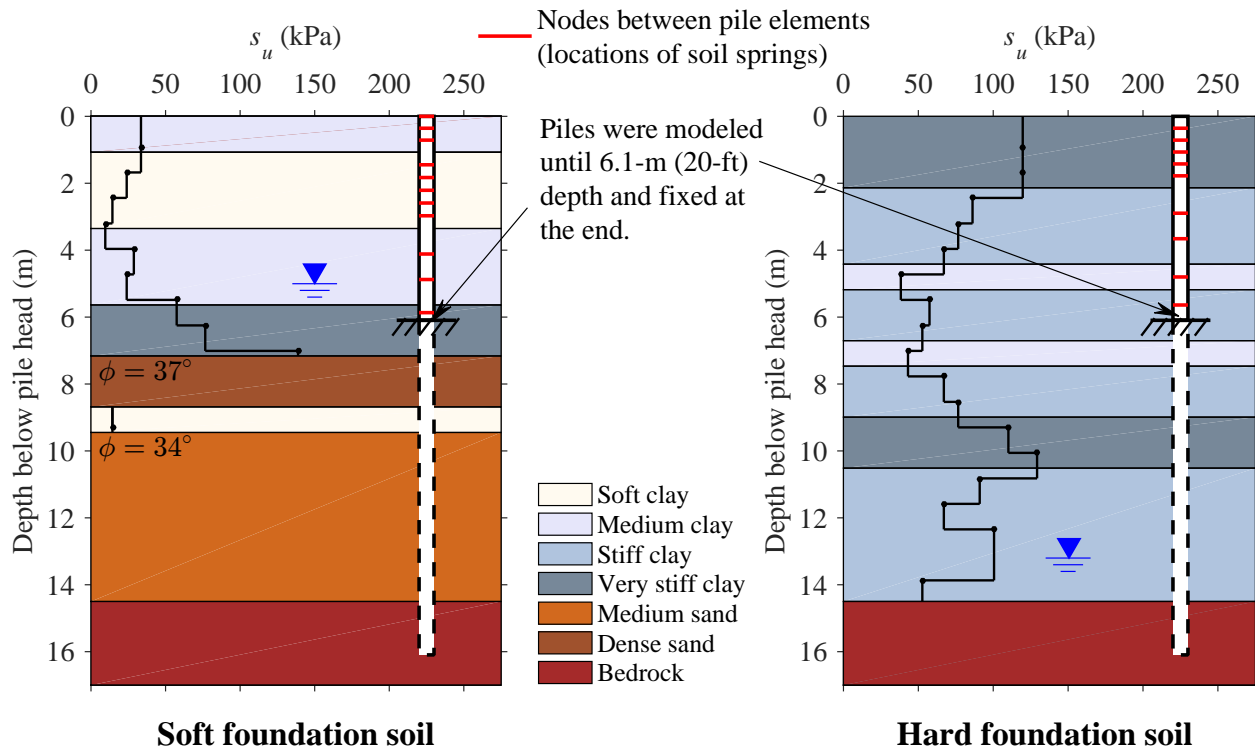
Soft and hard foundation soil profiles for modeling bridge pile foundations
